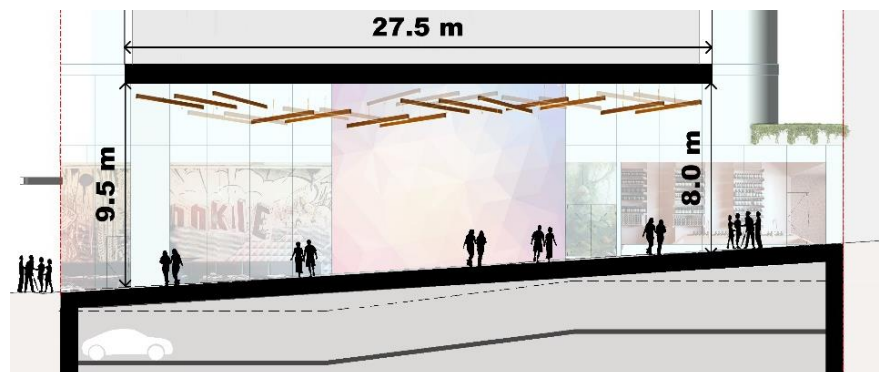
Section of Post Office Lane looking north (source: Mirvac Design)
